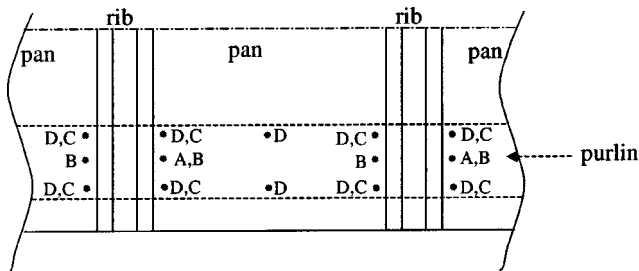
Plan view of fastener locations for panel-to-purlin connection
